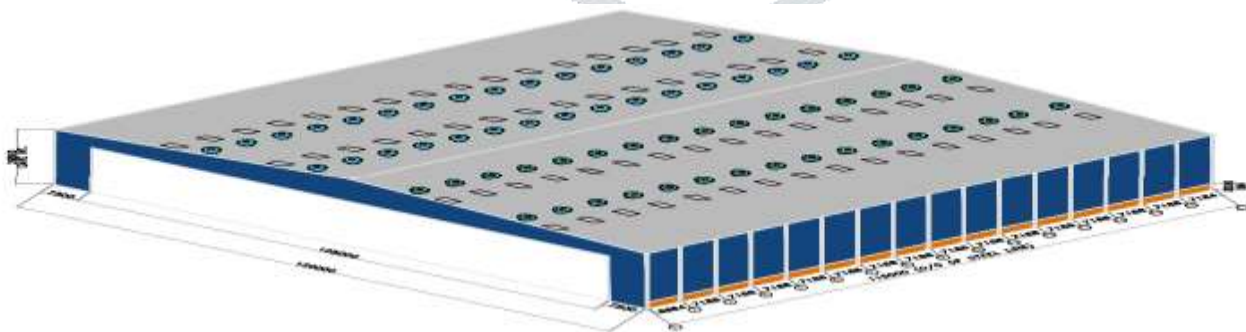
Sectional elevation for air-bus A-380 C.S.B hangar.
